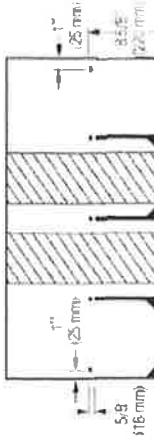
Five nails for every full Grand Manor Shingle, Carriage House Shingle, or Centennial Slate.
